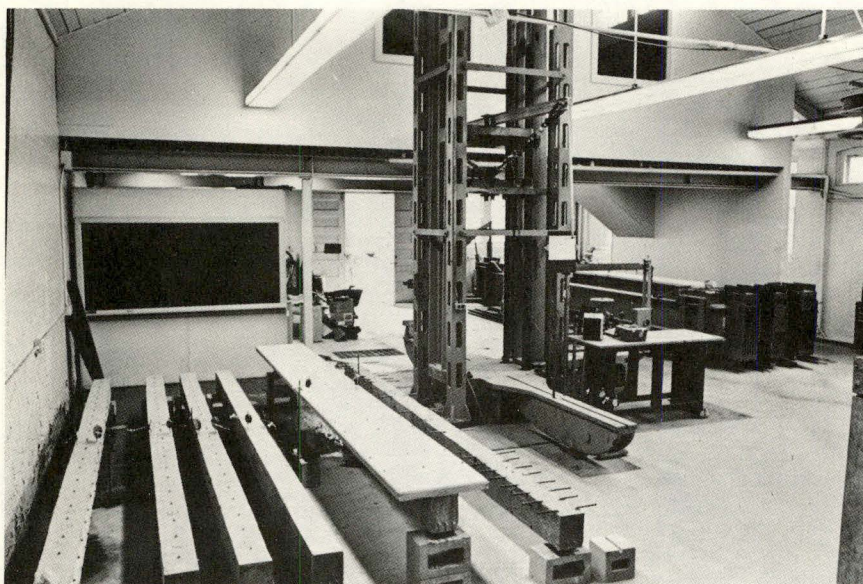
View of laboratory showing beams in foreground and prestressing bed containing additional beams at right. Two additional composite slabs (for a total of 4 composite beams) have since been cast
